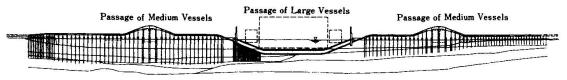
The Tokyo Bay Crossing Bridge-Tunnel
